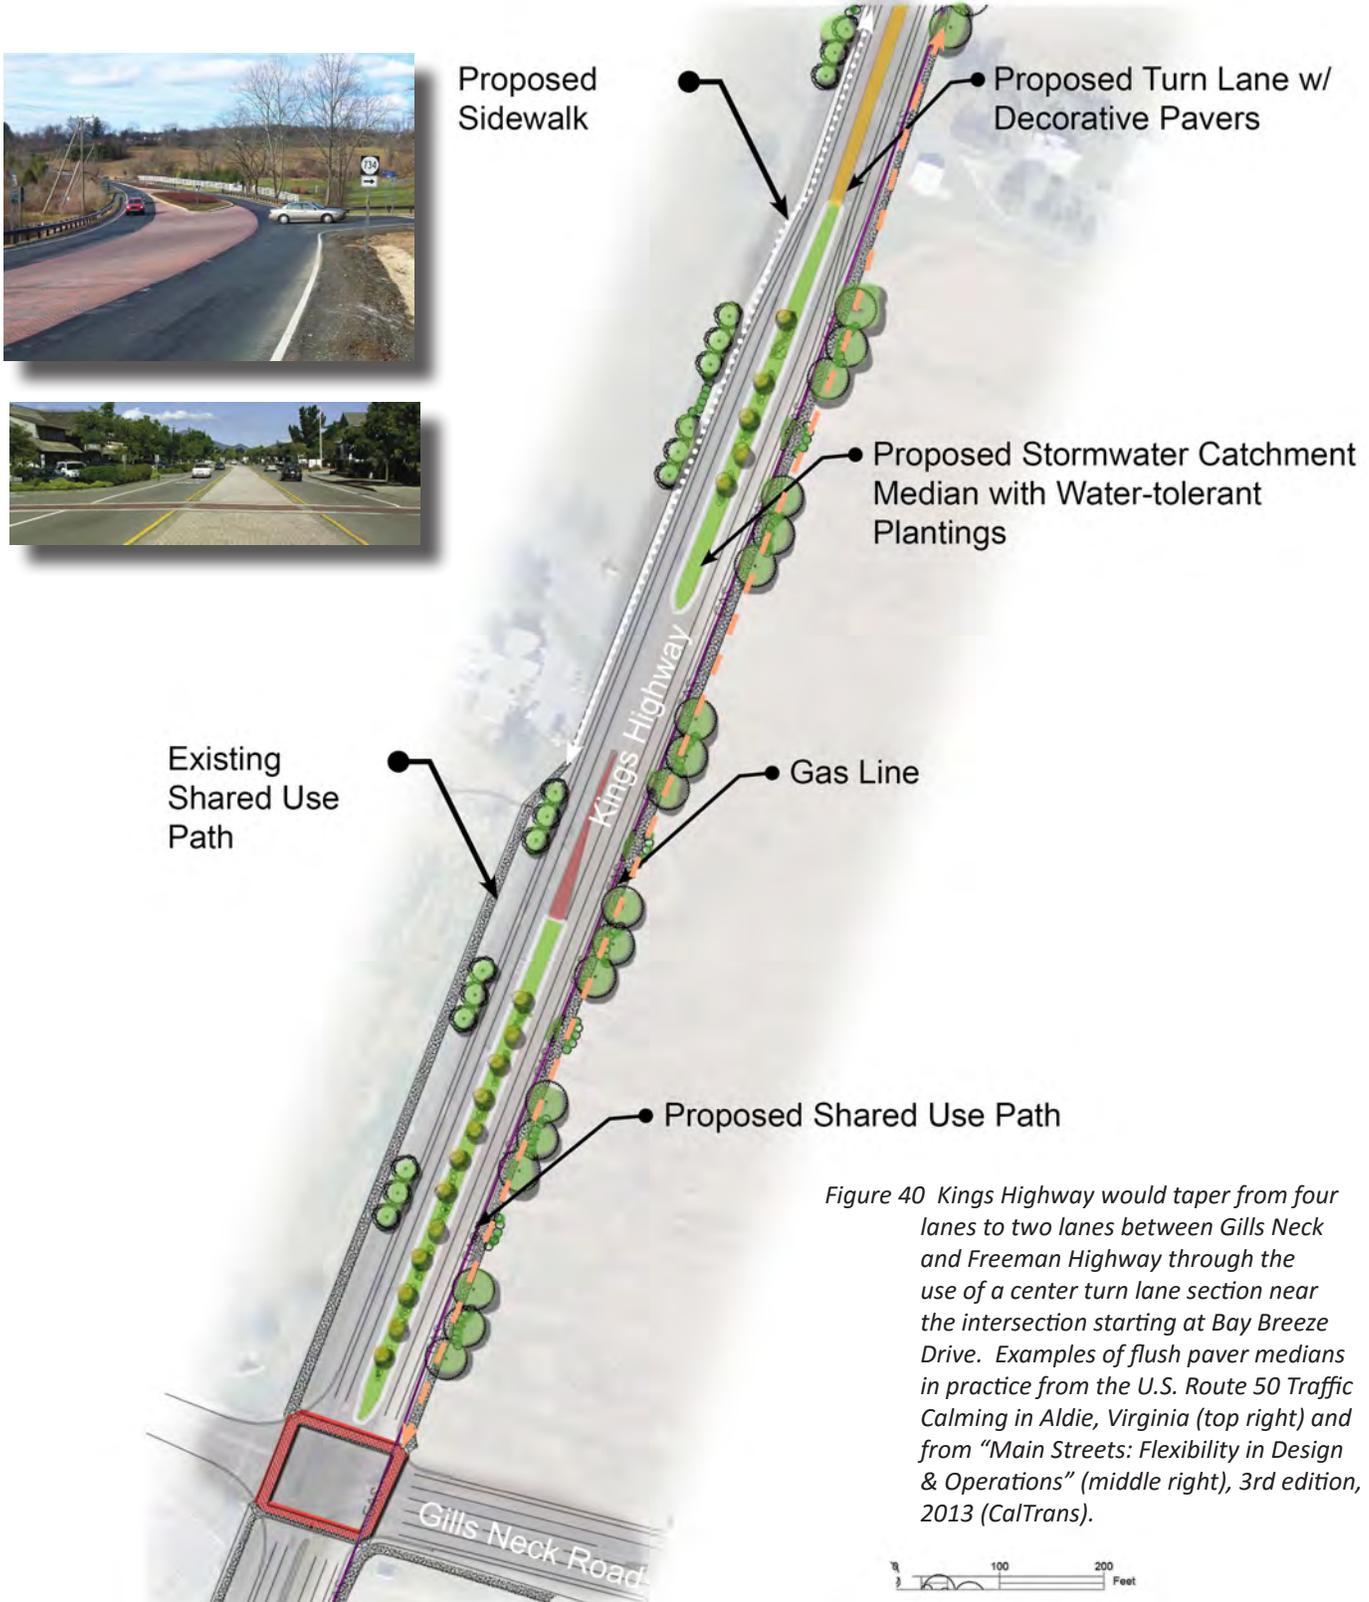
Kings Highway would taper from four lanes to two lanes between Gills Neck and Freeman Highway through the use of a center turn lane section near the intersection starting at Bay Breeze Drive. Examples of flush paver medians in practice from the U.S. Route 50 Traffic Calming in Aldie, Virginia (top right) and from "Main Streets: Flexibility in Design & Operations" (middle right), 3rd edition, 2013 (CalTrans).
